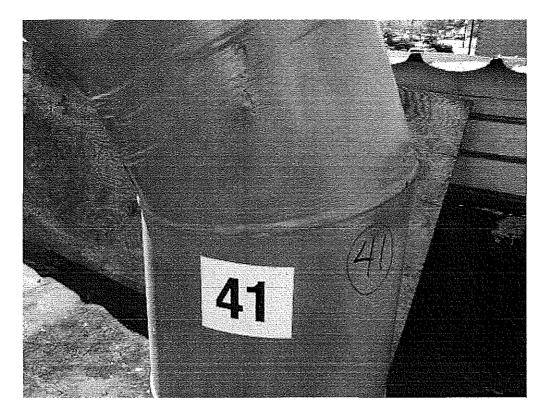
(Photo 9): Vertical duct V9 is labeled as exit point 41, for DCP rooftop diagram.
